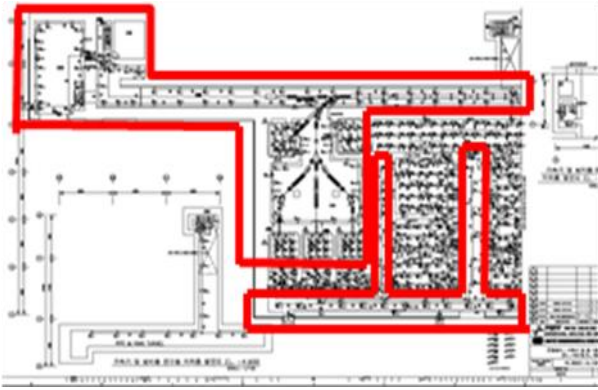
LED lights Installed area of Accelerator & Beam Application Research Building of PEFP
